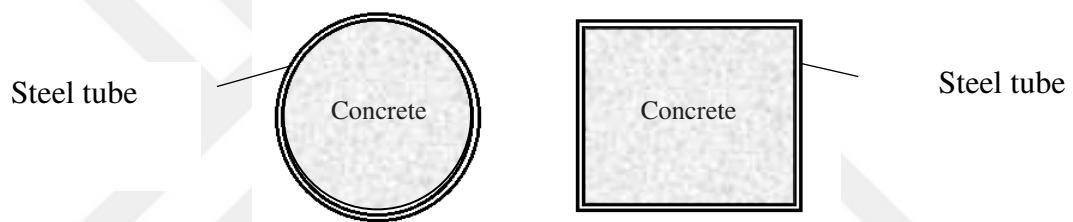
Concrete-filled steel tubular columns (Giakoumelis and Lam, 2004)
